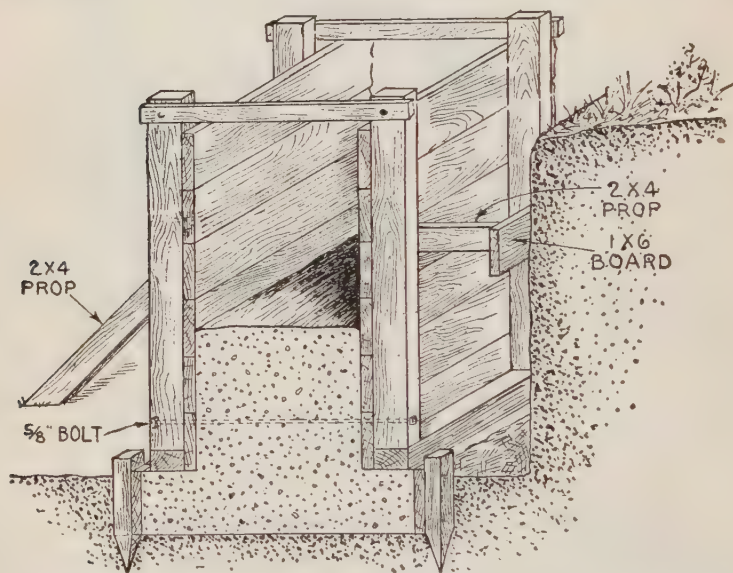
,769.—Form for concrete foundation wall and footing such forms should be made of semi-seasoned wood as when thoroughly seasoned, the wood will warp badly when the wet concrete is placed. Spruce, Norway pine, etc., are better woods to use than hard or Georgia pine. For ordinary foundation work 1-inch boards may be used. The studs may be assisted materially in holding the forms in position, by wires placed on studs. And by props placed against the dirt wall of the excavation. *In filling*, use a wet mix; lay a 4-inch layer and then spade or work it well into place. The smoothness of the resulting faces is increased by an additional spading of the mixture away from the form. A good spading tool is made by straightening out an ordinary garden hoe. Forms should be allowed to remain until the concrete will resist indentation with the thumb upon ordinary walls.
